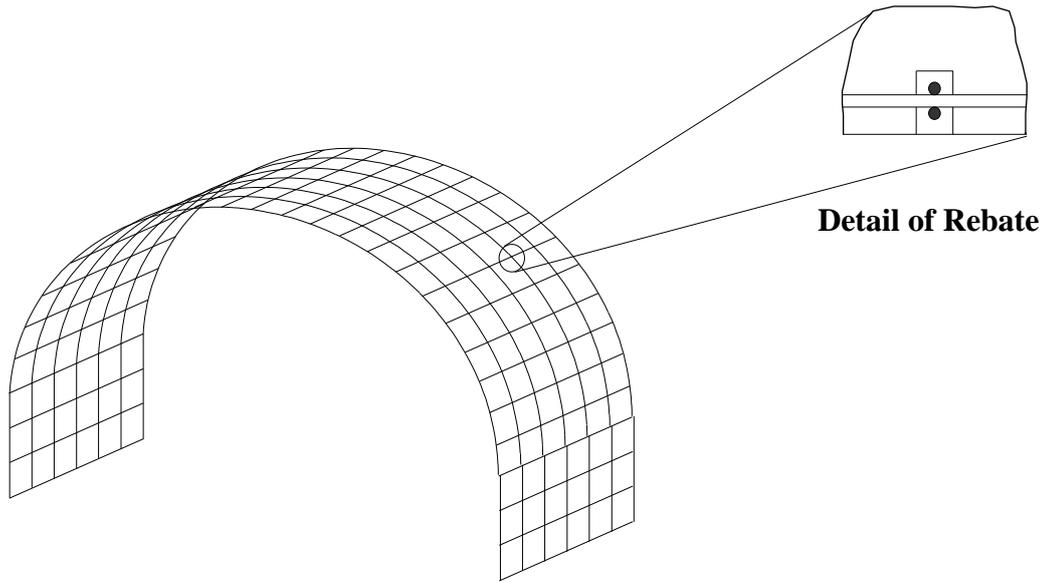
Schematic View of Arch Reinforcement Cage for Barrel only
